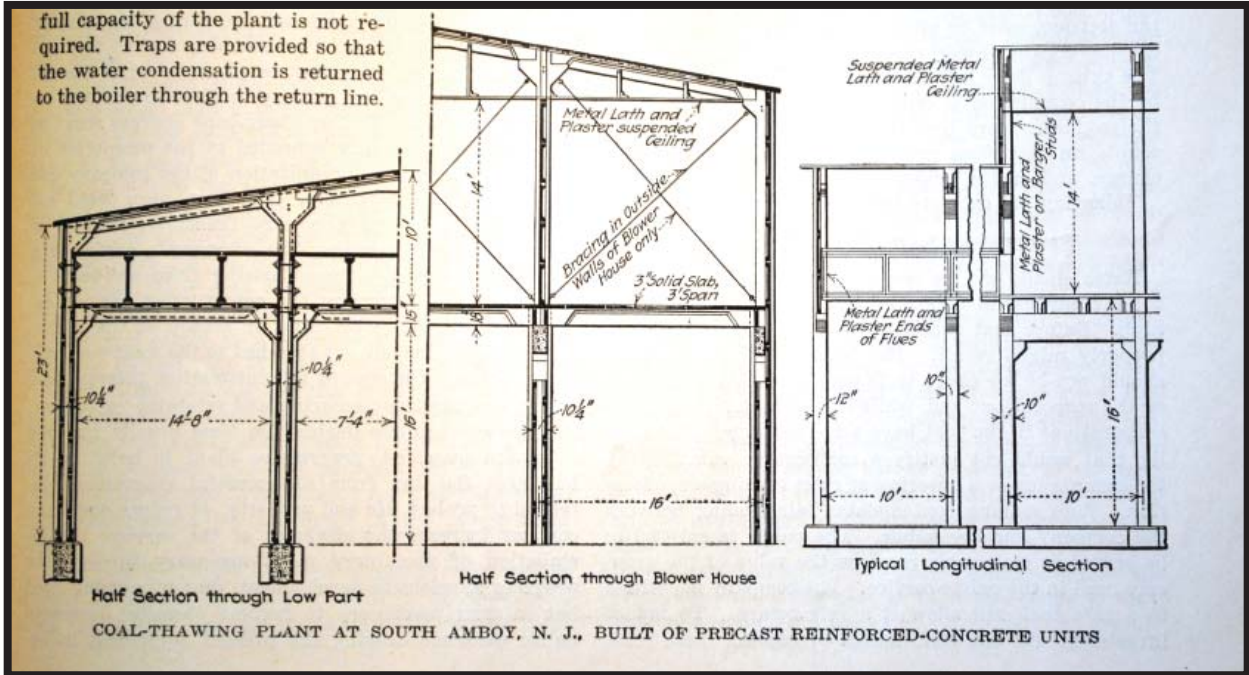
Cross Section of Framing for the Three-Track Coal Thawing House, Pennsylvania Railroad, South Amboy Terminal. 1916 (Source: Linn 1918a)
